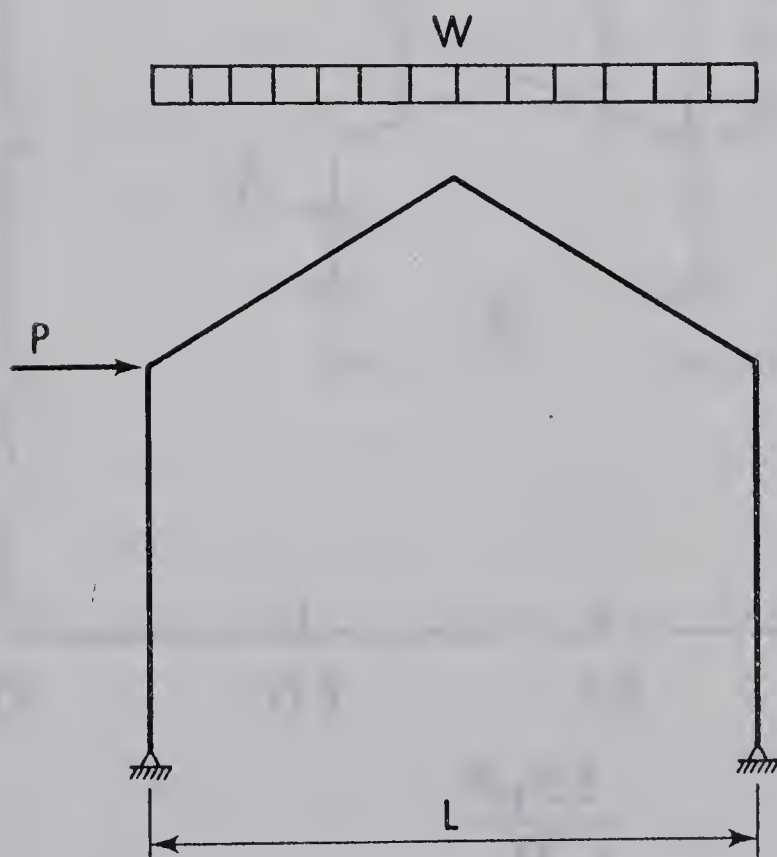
SINGLE SPAN RIGID FRAME
